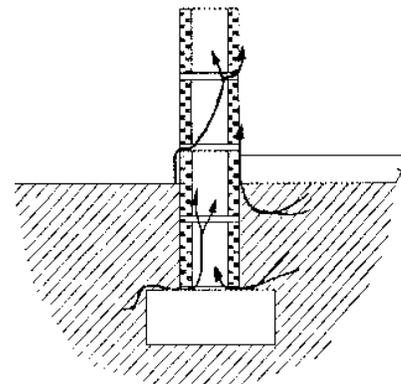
Block foundation—floating slab (arrows indicate possible termite entry points).
